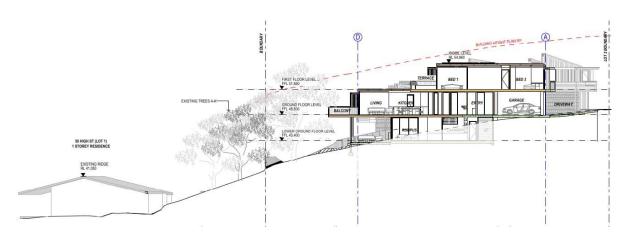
Extract of Plan prepared by *MacCormick + Associates Architects* showing Section C through proposed development, the sites natural slope and the dwelling on the rear adjoining property.
